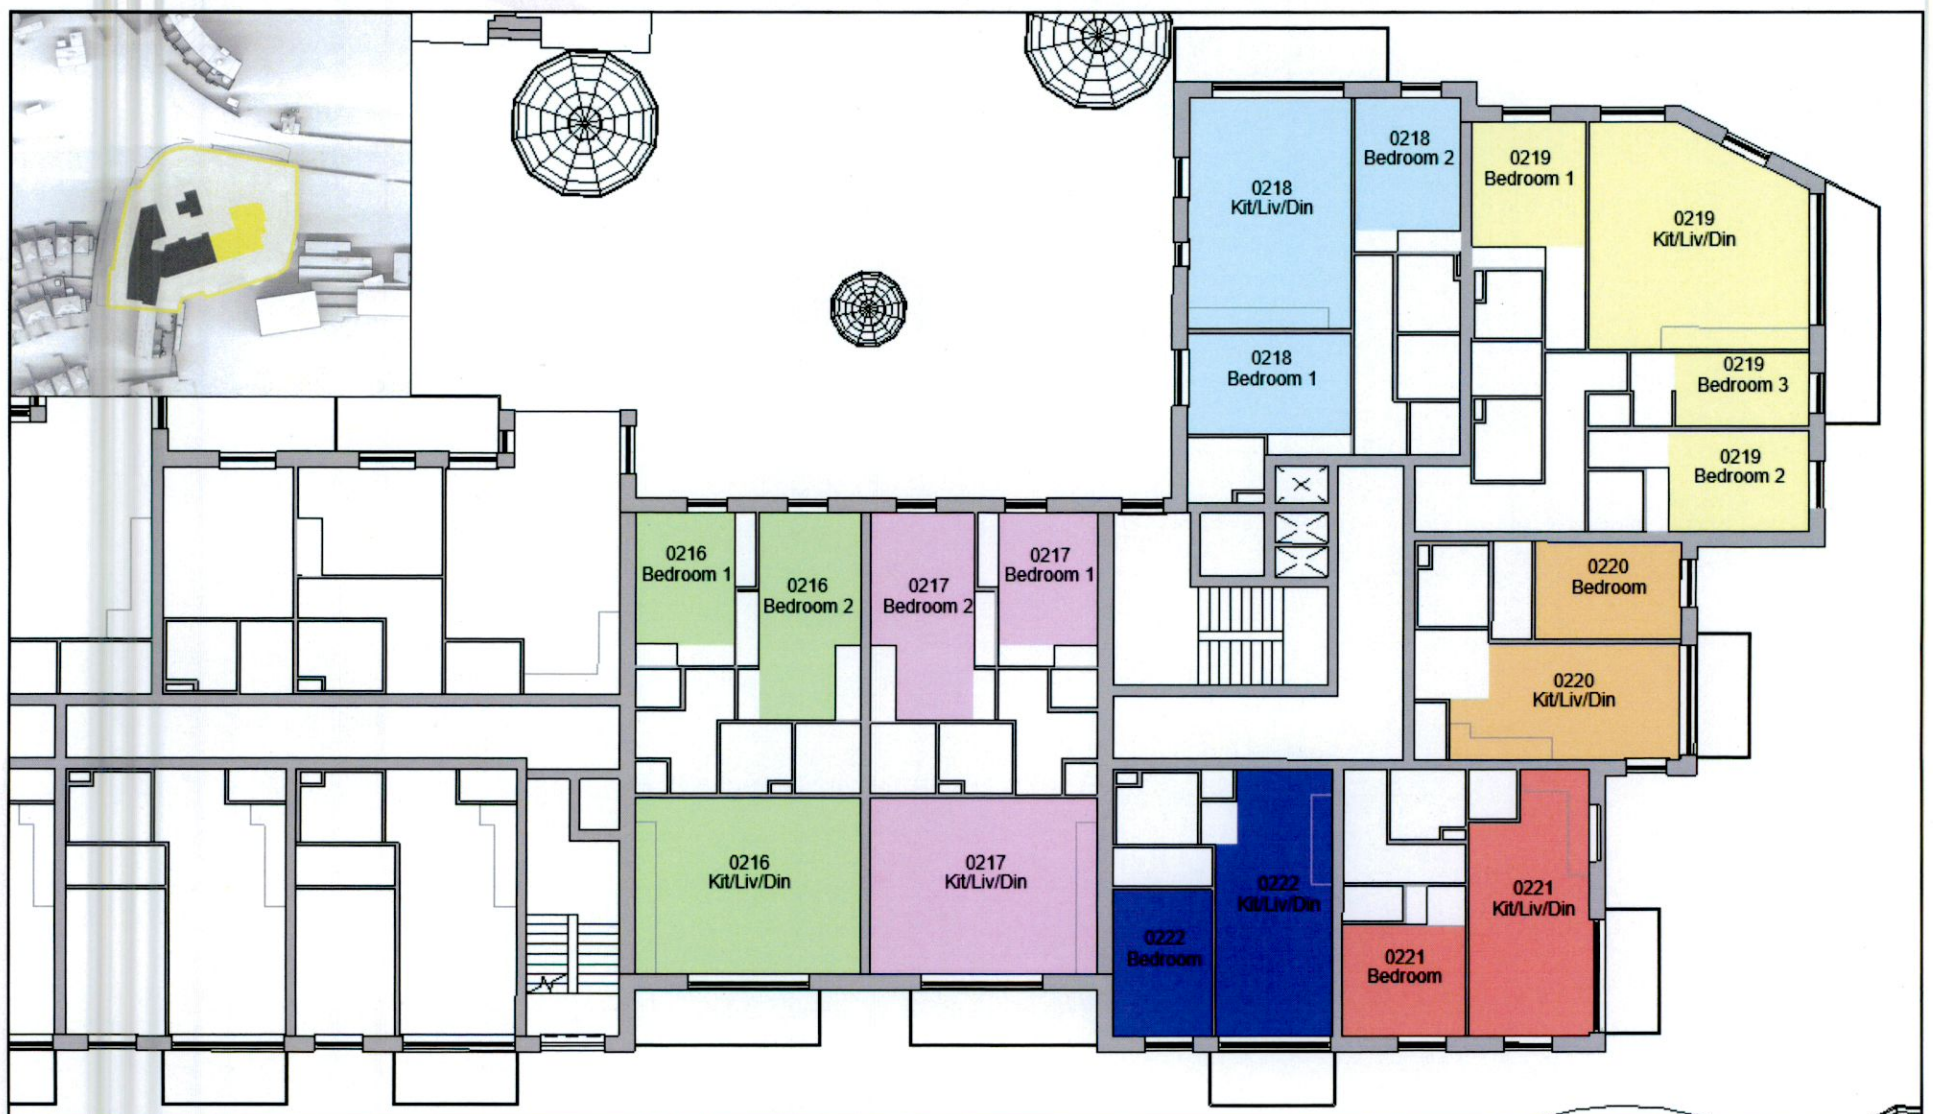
Floor plan of assessed building (L), Keyplan highlighting the assessed building (R).
